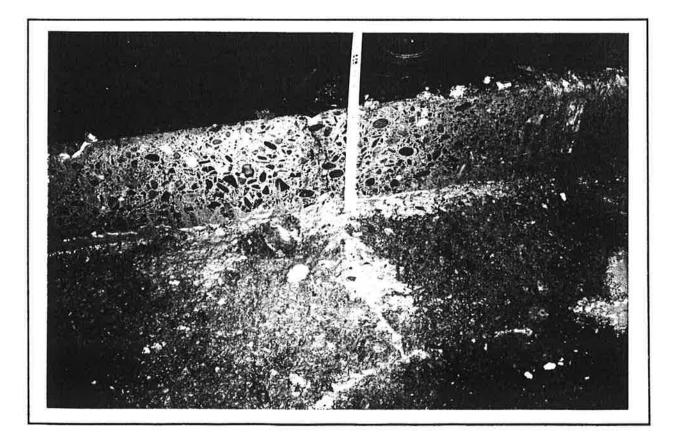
CROSS SECTION OF DRIP PAD SHOWING CRACK AND UNDERLYING SOILS
